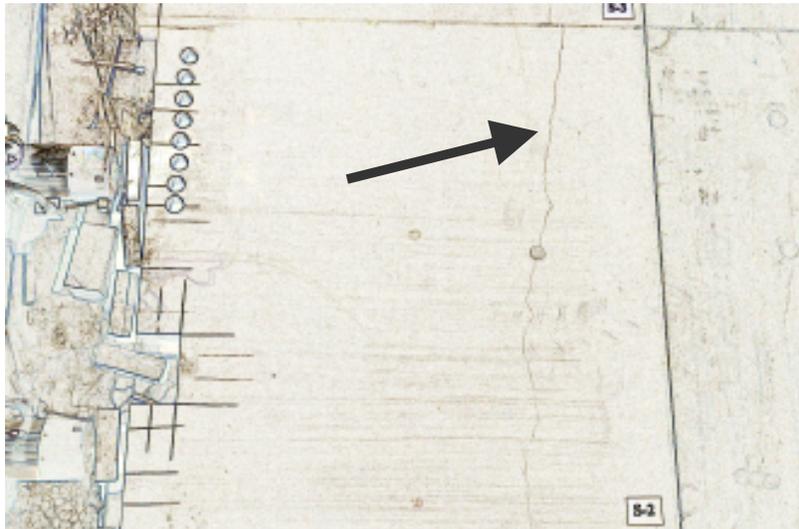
Top-Down Longitudinal Crack of Unloaded Slab Observed at NAPTF (CC2, Slab S-2).
